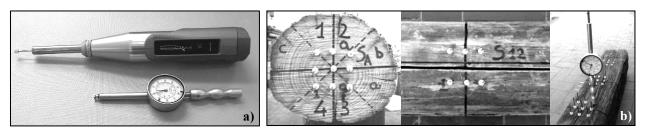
Sclerometric tests: a) Testing apparatus; b) Experimental set-up.
